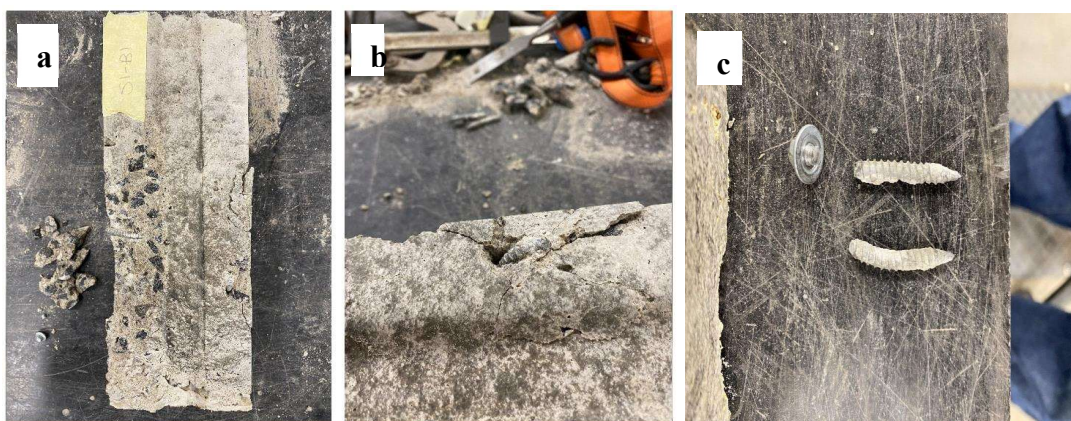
(a) screw head during testing (b) screw shearing failure (c) failure via concrete crushing.
